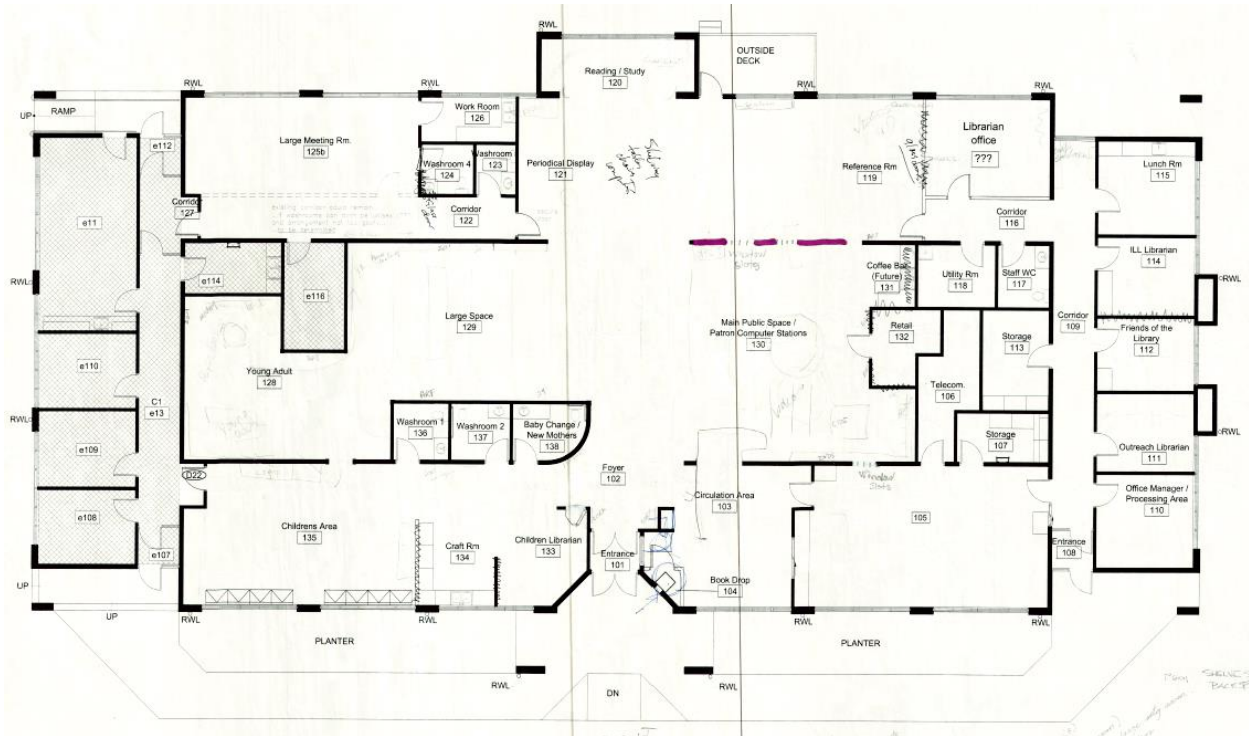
Creston Public Library Floor plan located at 531 – 6th Ave. S., Creston, BC
